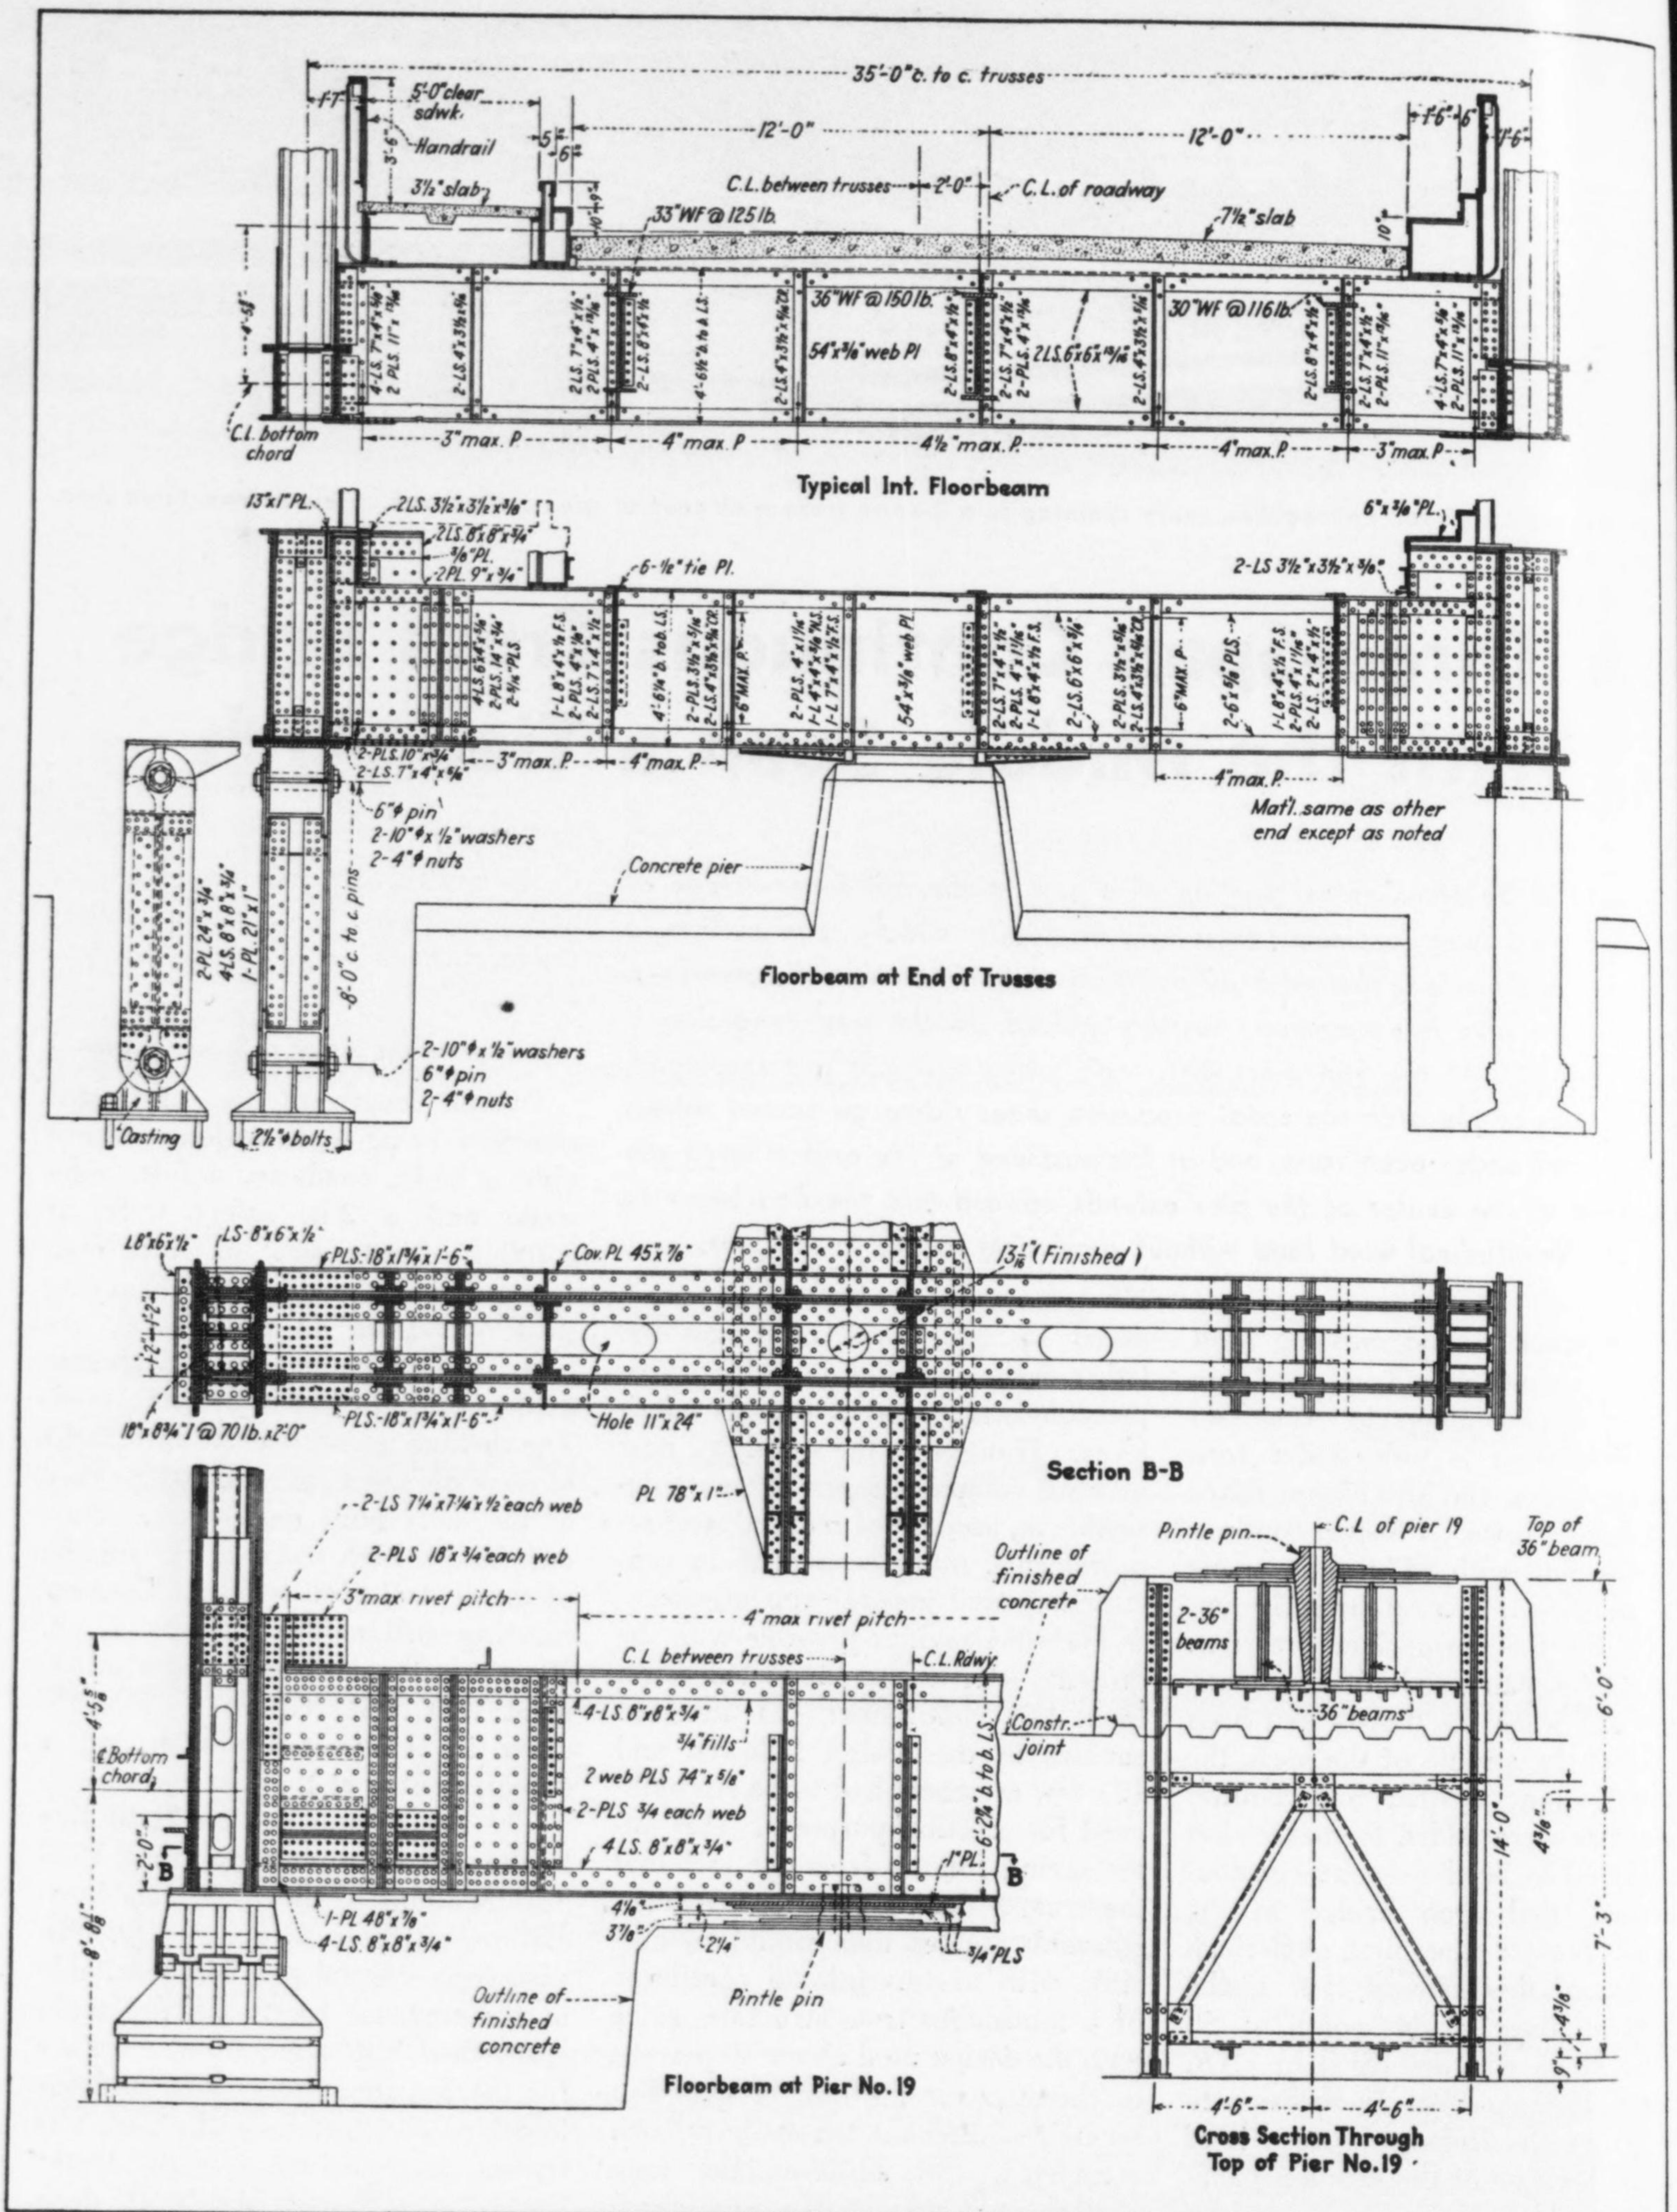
Most floorbeams for truss spans are of top design, which also shows roadway details. Ends of trusses are supported by 8-ft. long rocker columns; since columns were not designed to carry transverse wind loads, this load is transferred to pier through floorbeam by strengthening this member at the ends and adding brackets each side of pier top. At each end of middle span floorbeams have double webs. That at Pier 19 accommodates pintle pin that carries the longitudinal wind and traction loads for entire 3-span unit. A structural framework encased in concrete near top of pier is provided to support pin, as shown by lower right detail.
